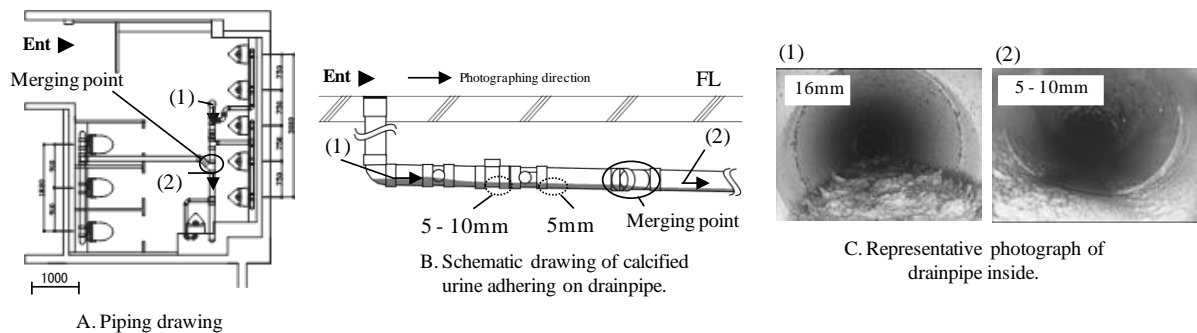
Piping drawing, schematic drawing of calcified urine and photograph of drainpipe at School Facility E
